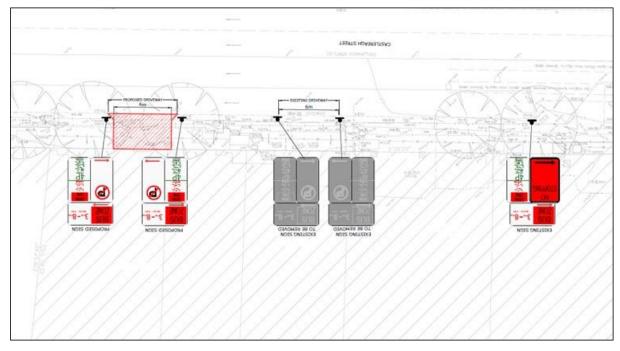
Proposed Parking/ Loading Zone and Bus Zone Signage
